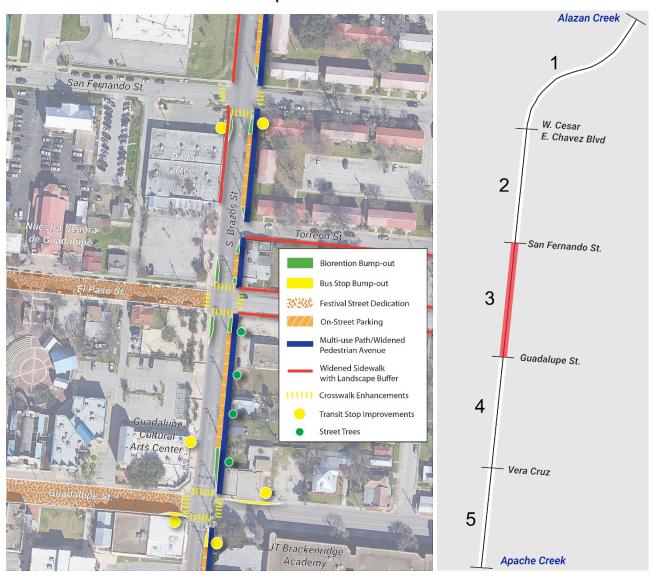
Proposed Improvements - San Fernando to Guadalupe Street
